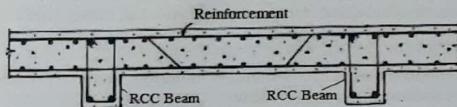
Reinforced cement concrete floor (RCC floor)
